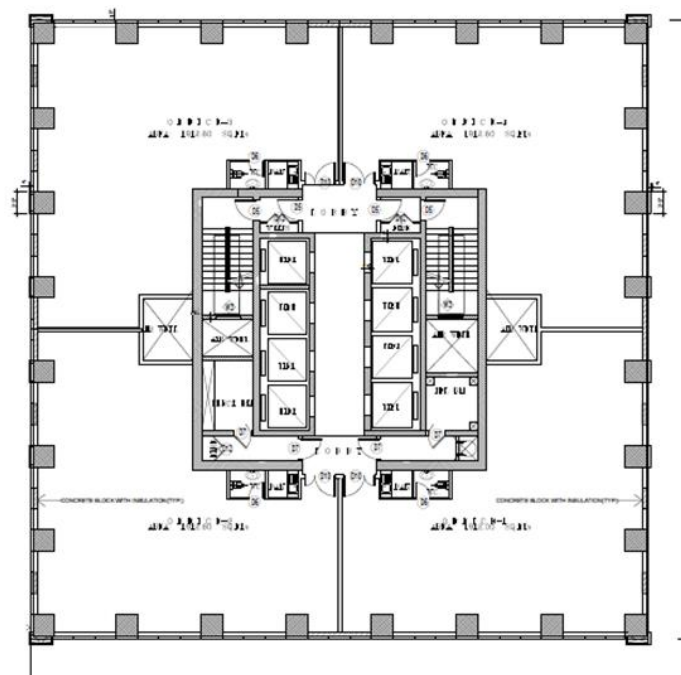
Typical floor level of the existing building (AutoCAD software).
